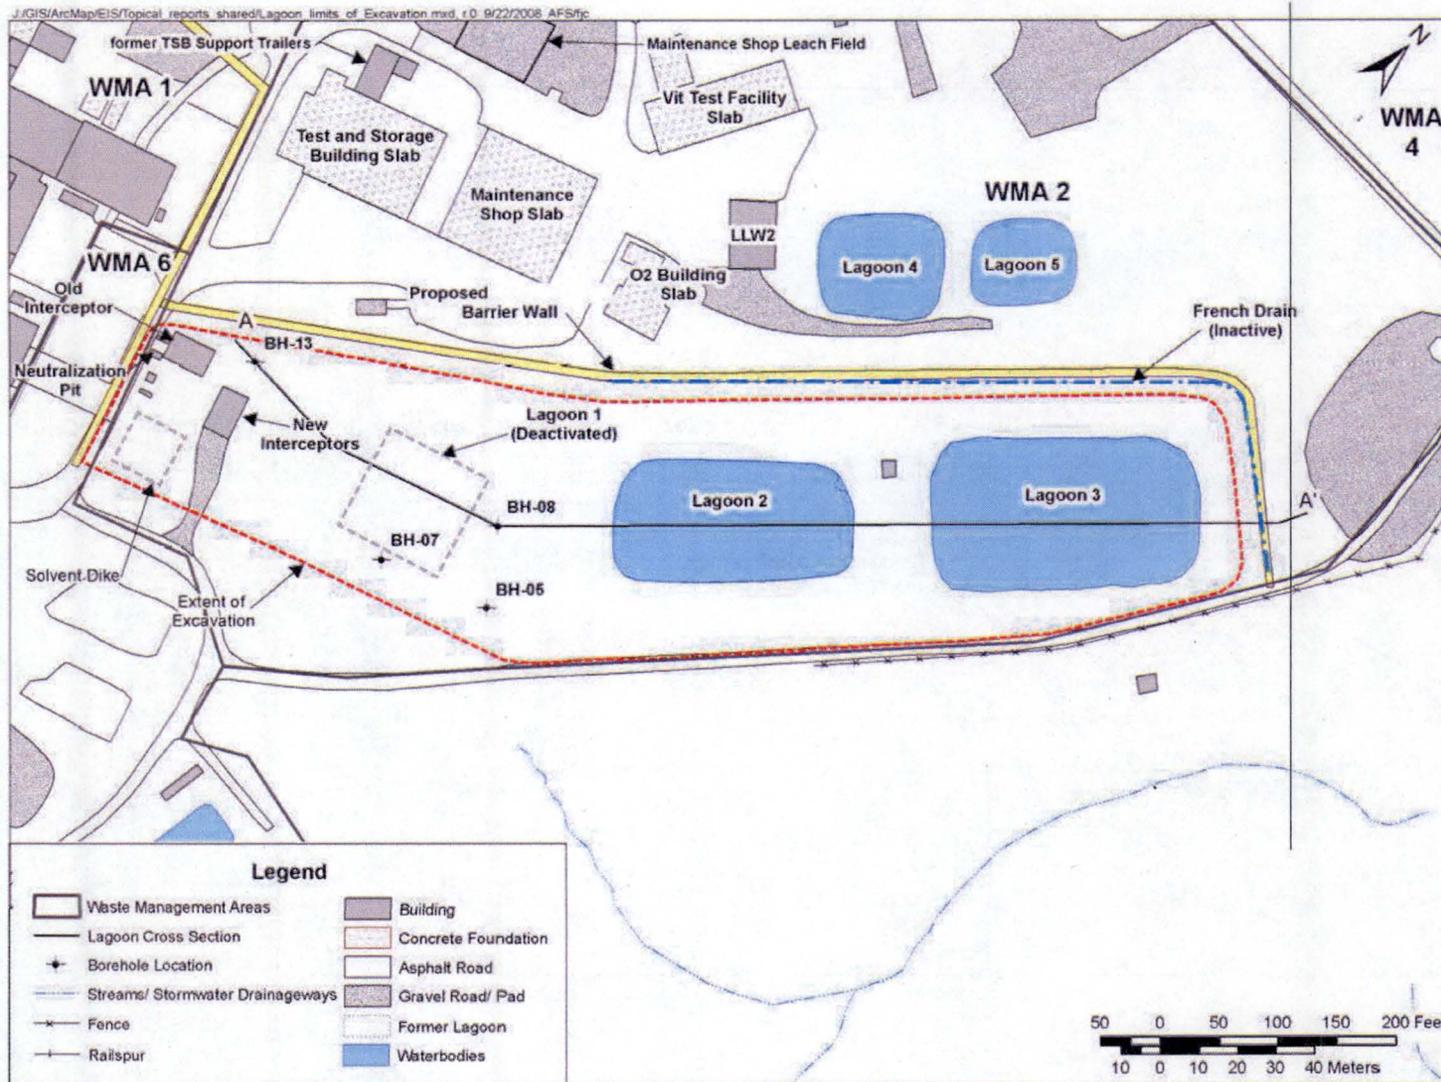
Conceptual Arrangement of WMA 2 Excavation, Plan View
